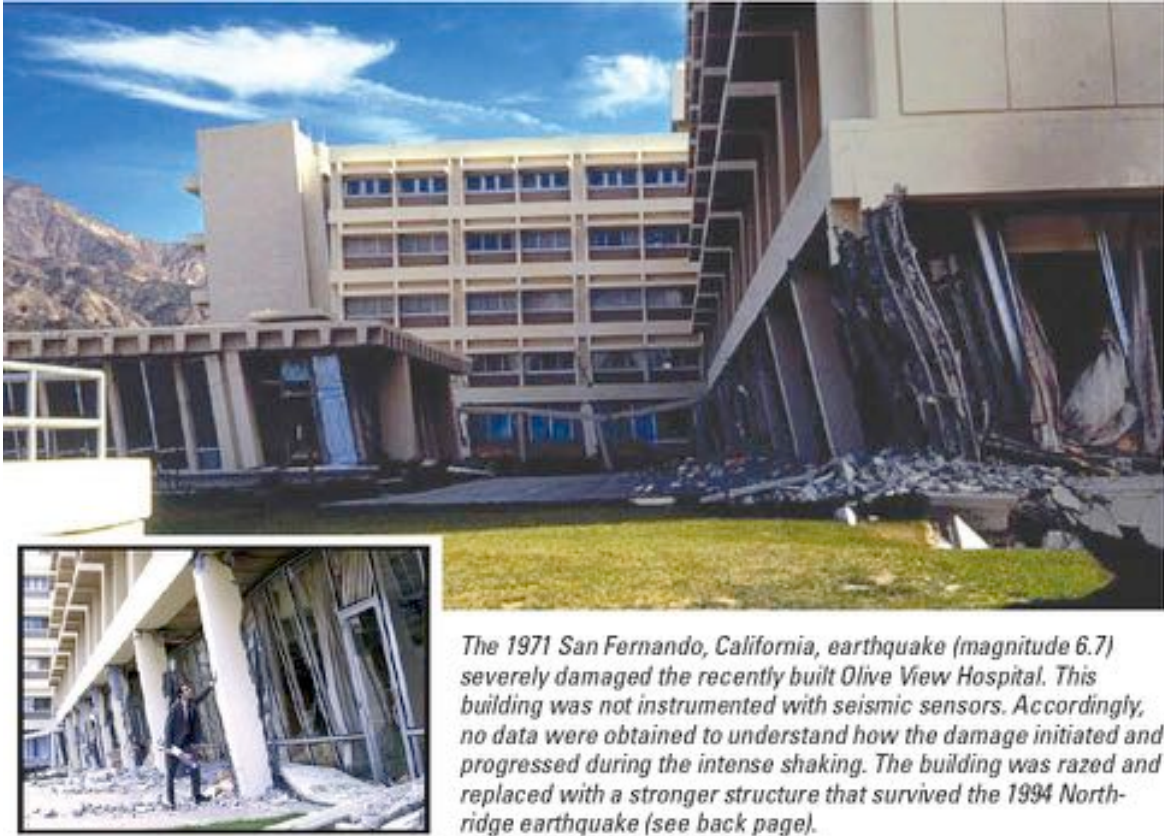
Example of soft first story construction in public hospital (see USGS Fact Sheet 068-03).
